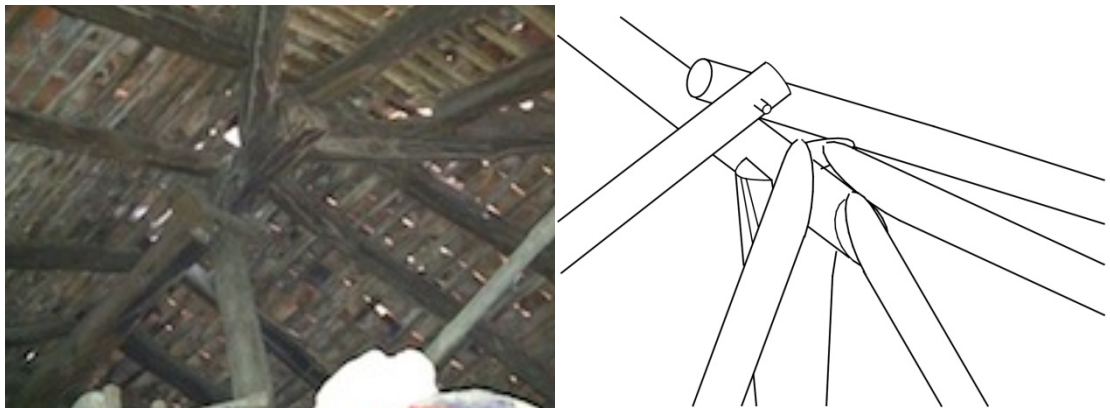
End of ridge beam supporting multiple rafters in *ath-chala* roof
